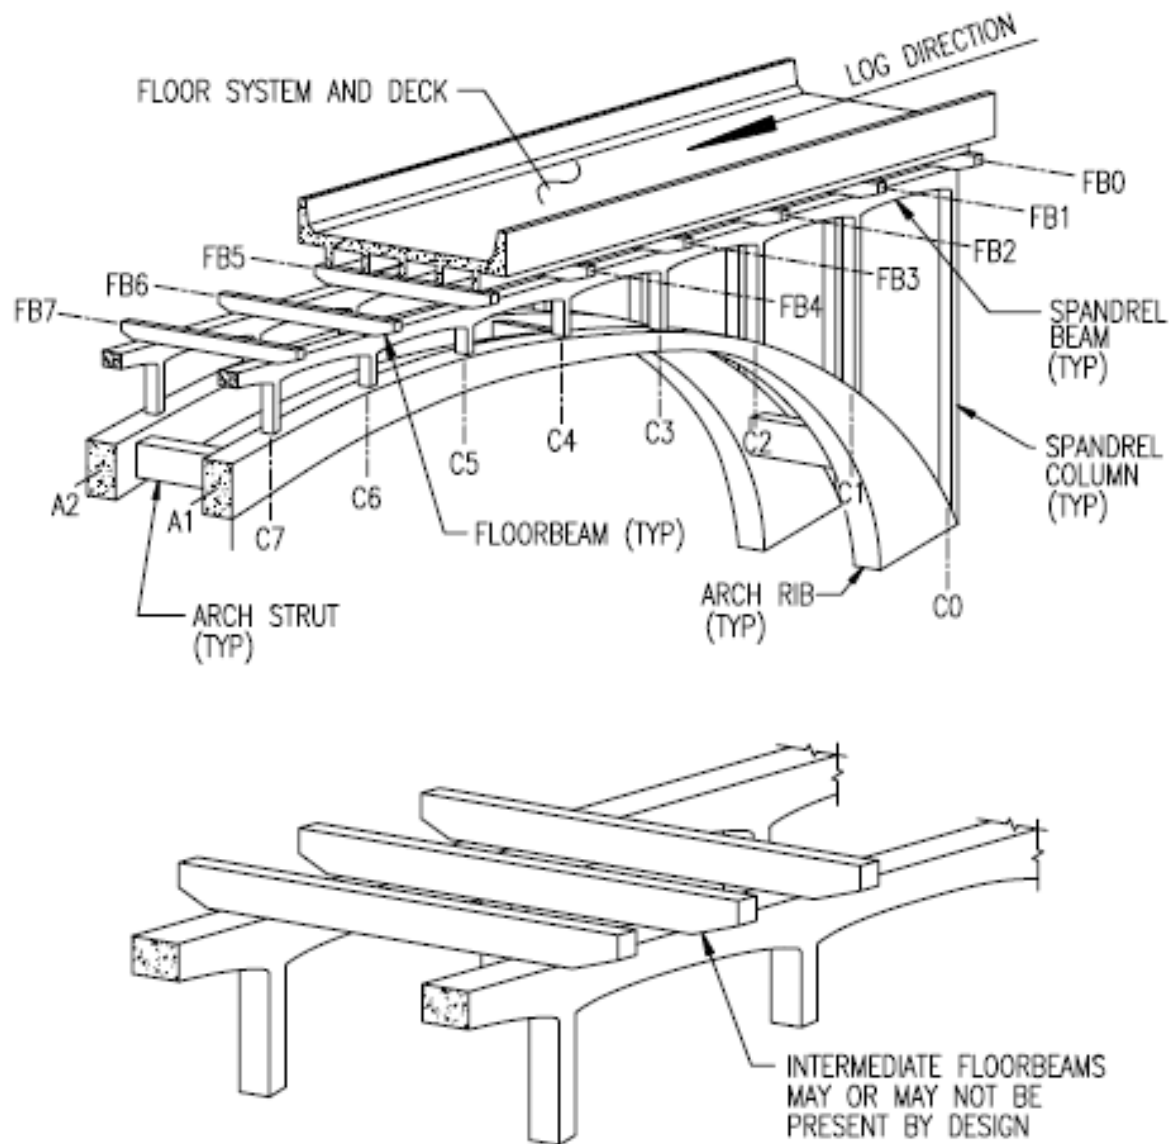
Open Spandrel Concrete Arch Bridge Components.
